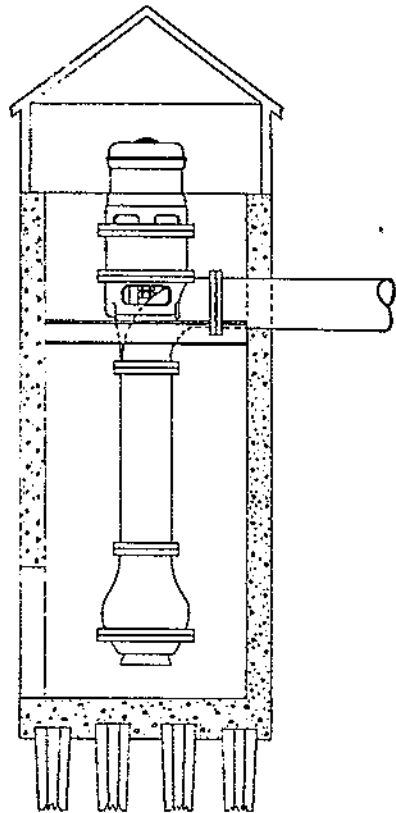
Submerged vertical pump direct-connected to vertical motor resting on piling.
